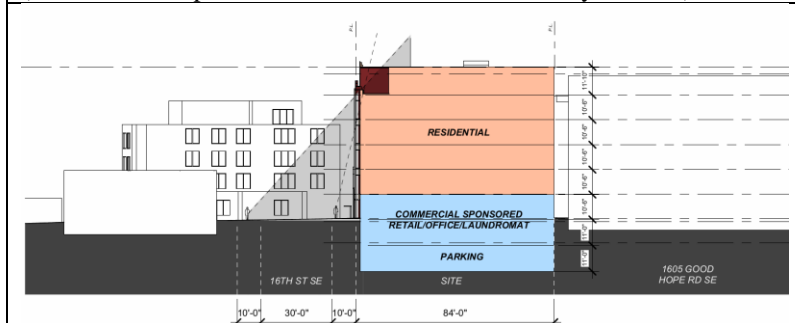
East-west section diagram through Property looking north toward Marion Barry Avenue, SE.
